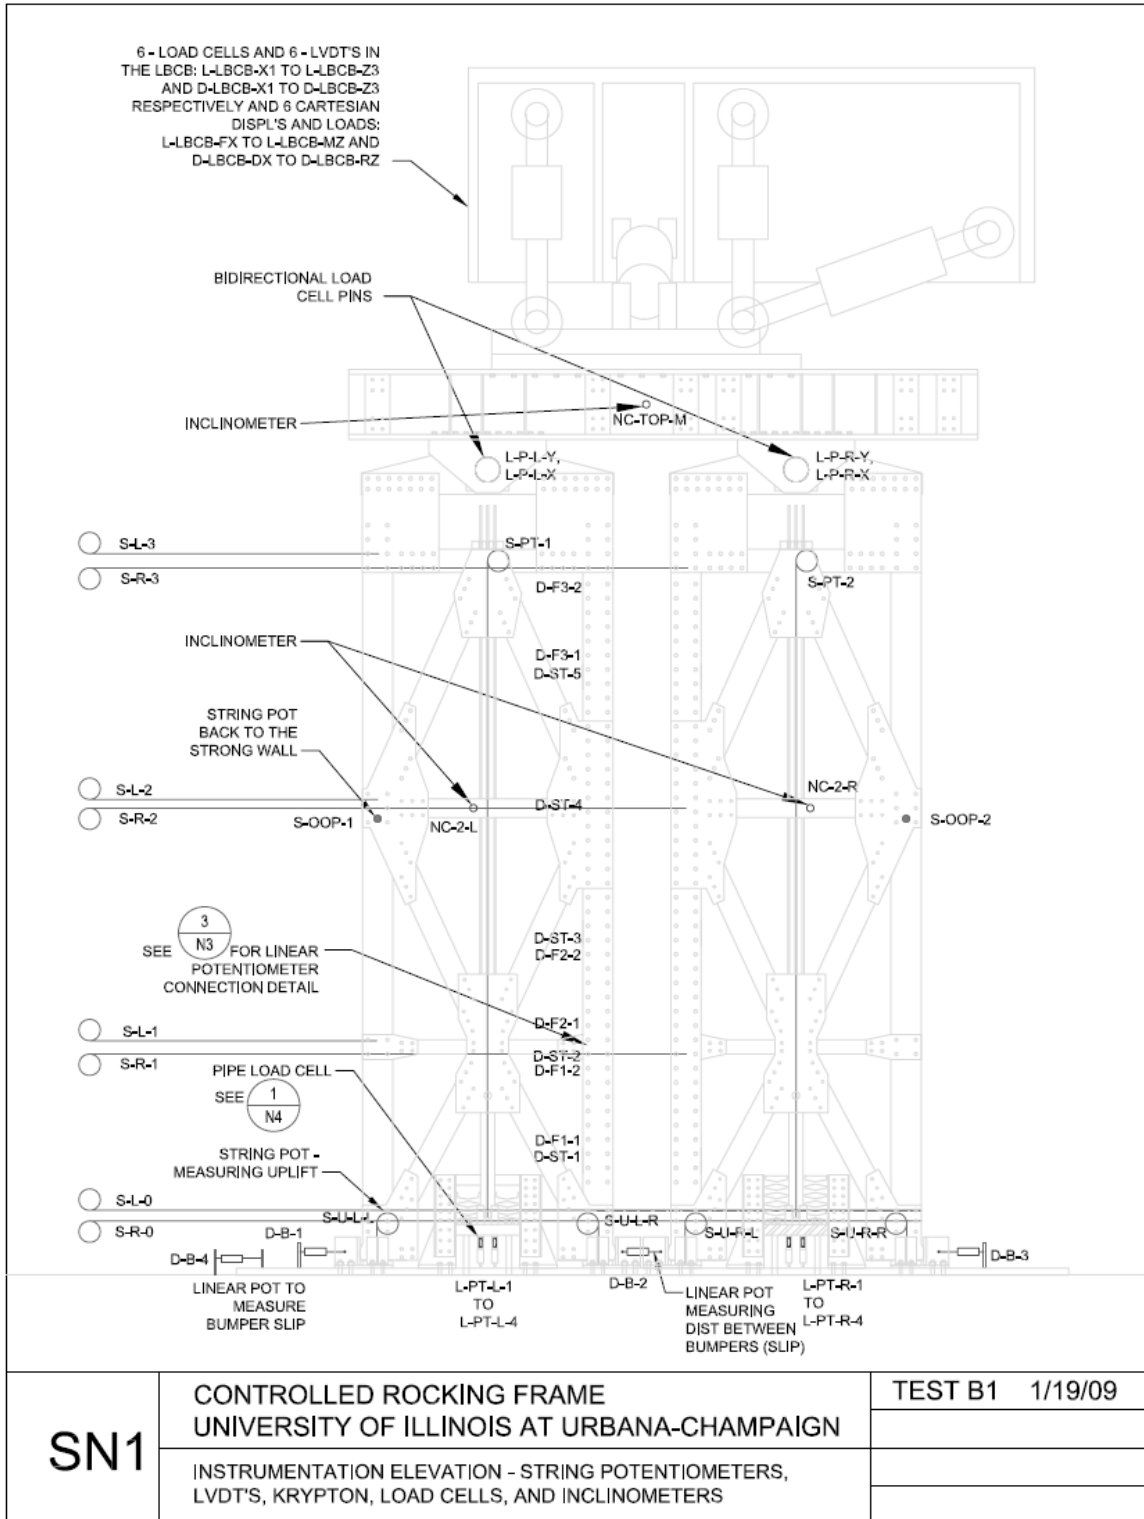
Single Frame Instrumentation Plan – Displacement and Inclinometers
